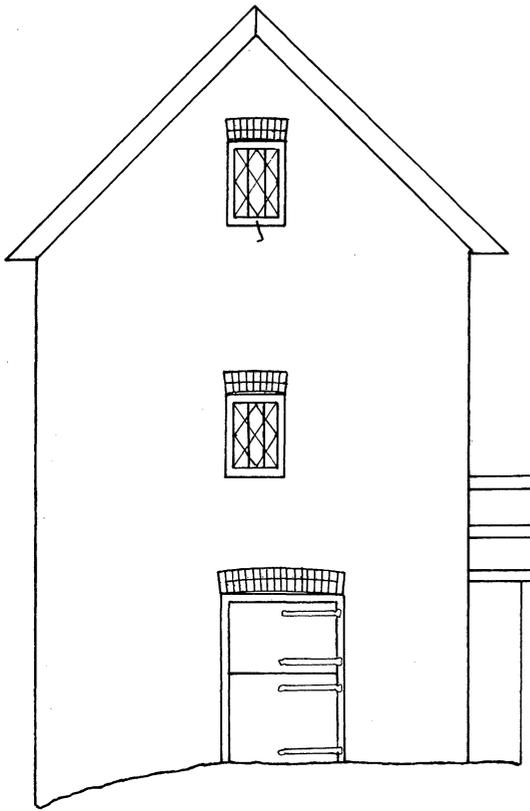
Paddington Mill: west elevation with the passageway and bridge at the right
